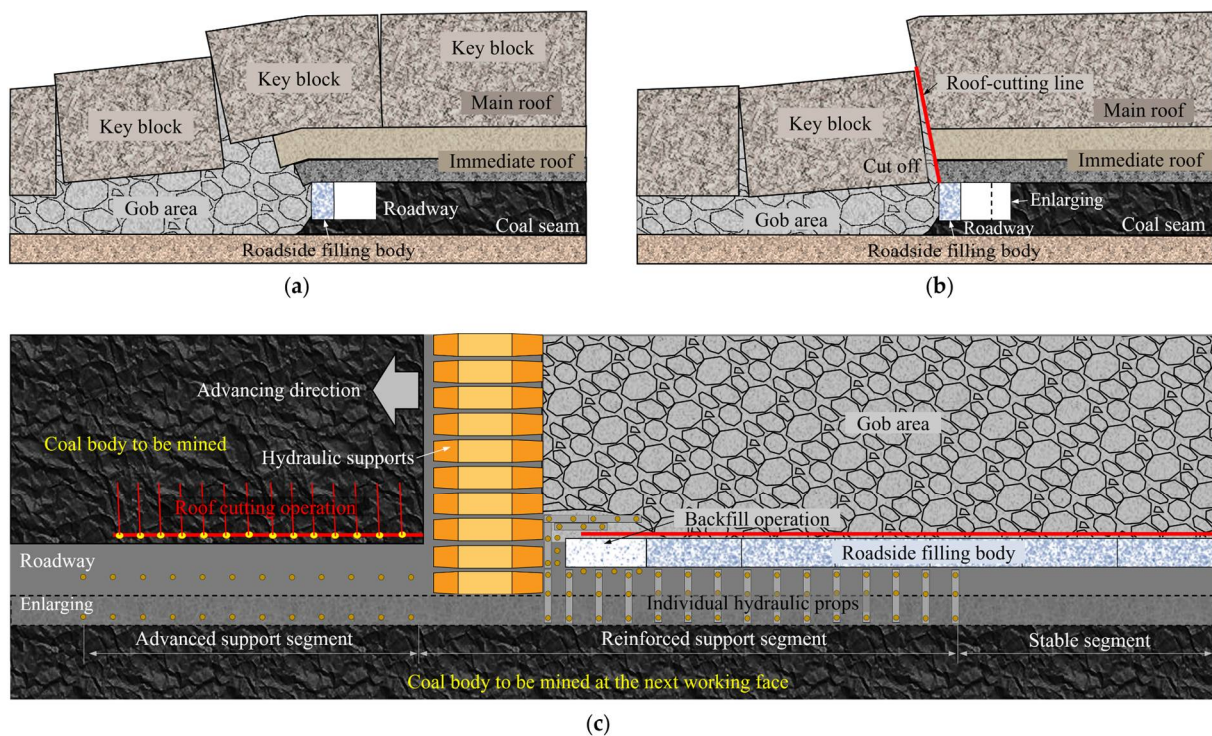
Advance pre-splitting and cutting roof for gob-side entry retaining. (a) Gob-side entry retaining with backfill (b) Roof cutting operation in advance (c) Working methods of roof cutting in advance and gob-side entry retaining with backfill.
